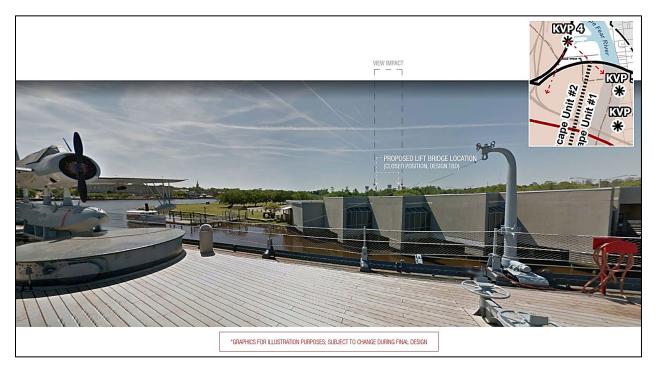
KVP 4[b] – Proposed view looking southeast across USS North Carolina portside deck toward Visitors Center and Cape Fear River with addition of proposed rail bridge towers barely visible, along with Memorial Bridge towers, at center distance
